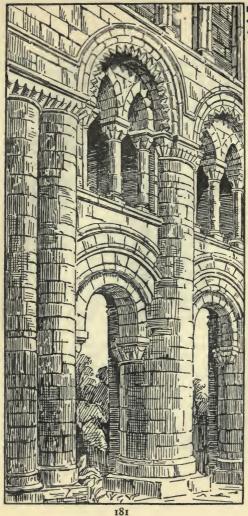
WALL DIAGRAM AND SECTION OF CHURCH.
